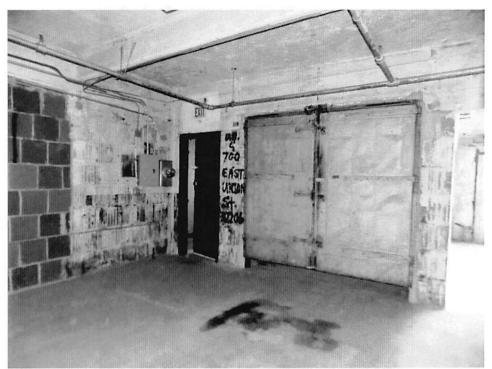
Interior, fourth floor Unit E, elevator and fire shutter doors, looking northeast.
